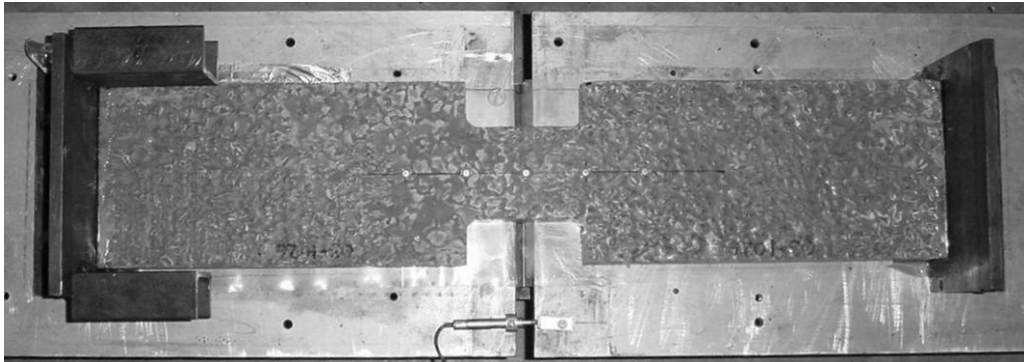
Specimen used to determine the resistance of grouted macadams to thermally induced cracking
